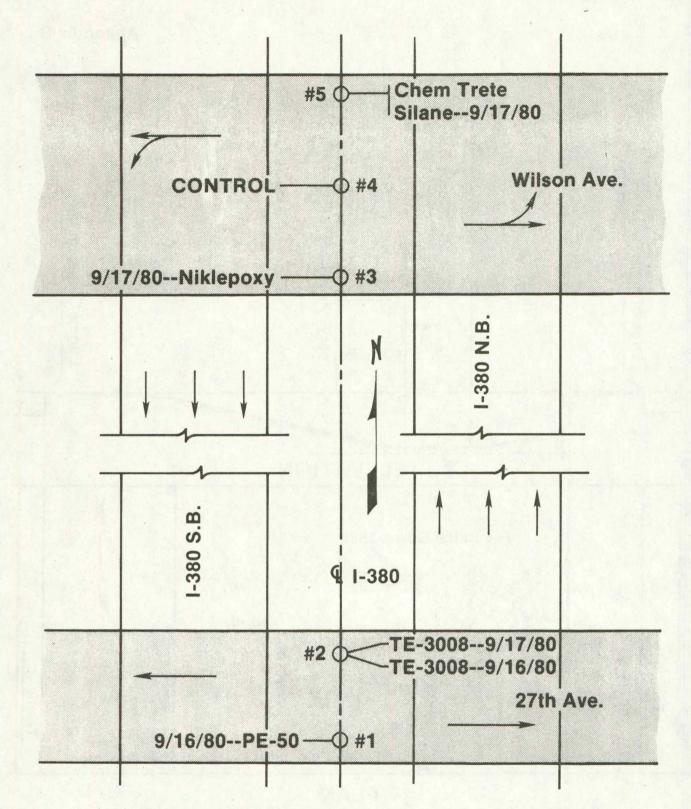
SITE LOCATION COLUMN IDENTIFICATION
